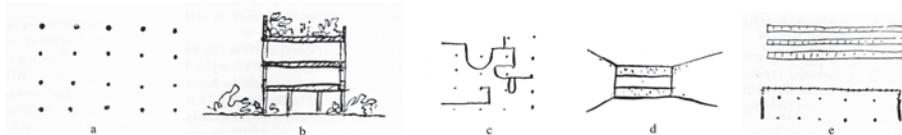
Since 1922, Le Corbusier has made use of his five principles of architectural design construction: (a) the pillar, (b) the roof garden, (c) the functional independence of skeleton and wall, (d) the elongated window and (e) the free façade.
